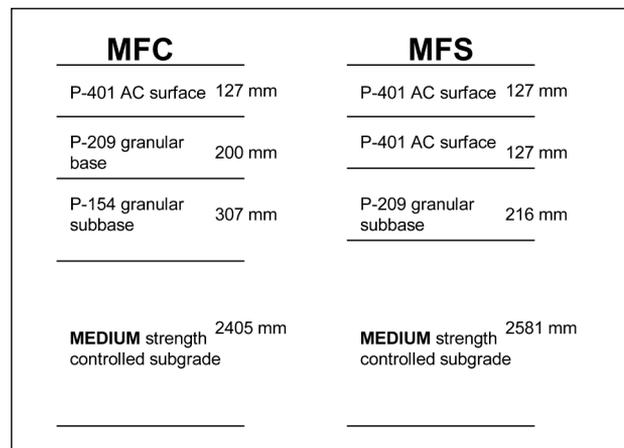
Cross-sectional views of as-constructed NAPTF flexible test sections
